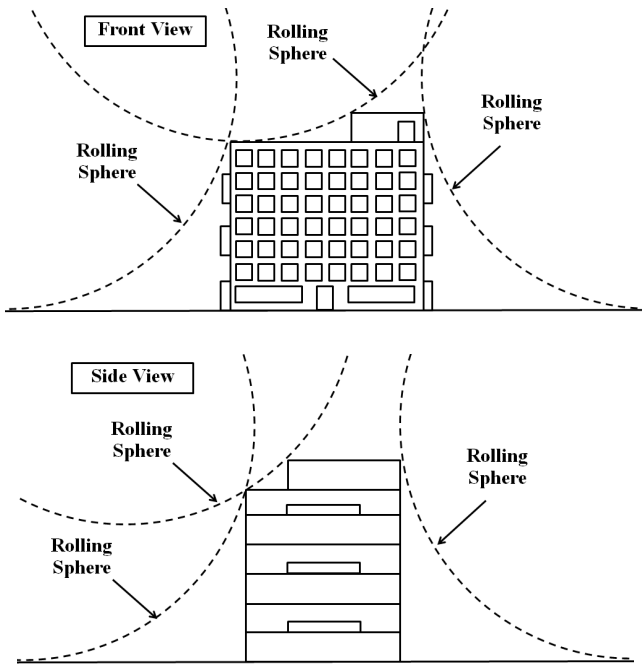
Sketching 2-D rolling sphere in the architectural drawing plan.
